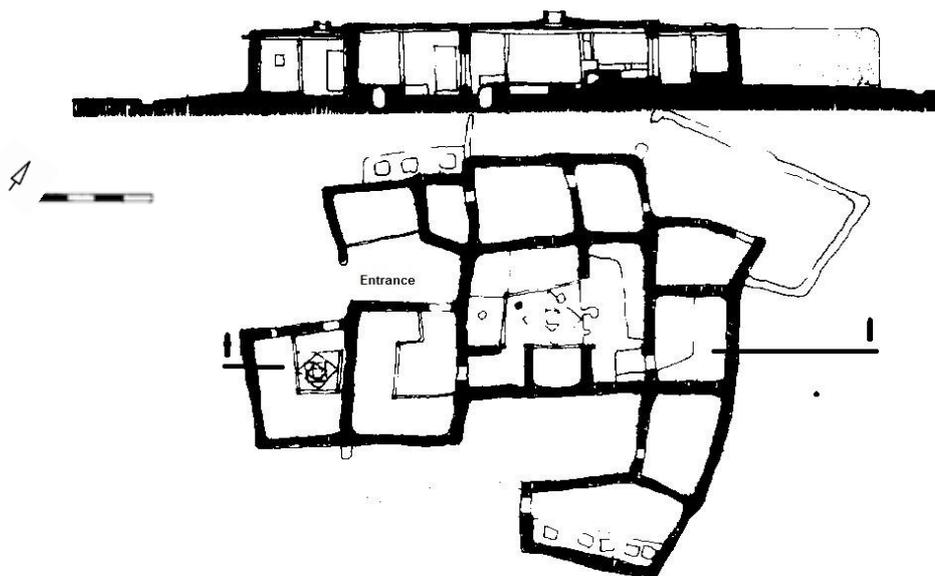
The integrated houses in Ptukh village in Wakhan Valley, Up: section, Down: plan (Supic, 1982)
